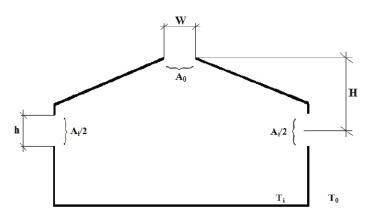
sketch building showing open ridge and side openings.
